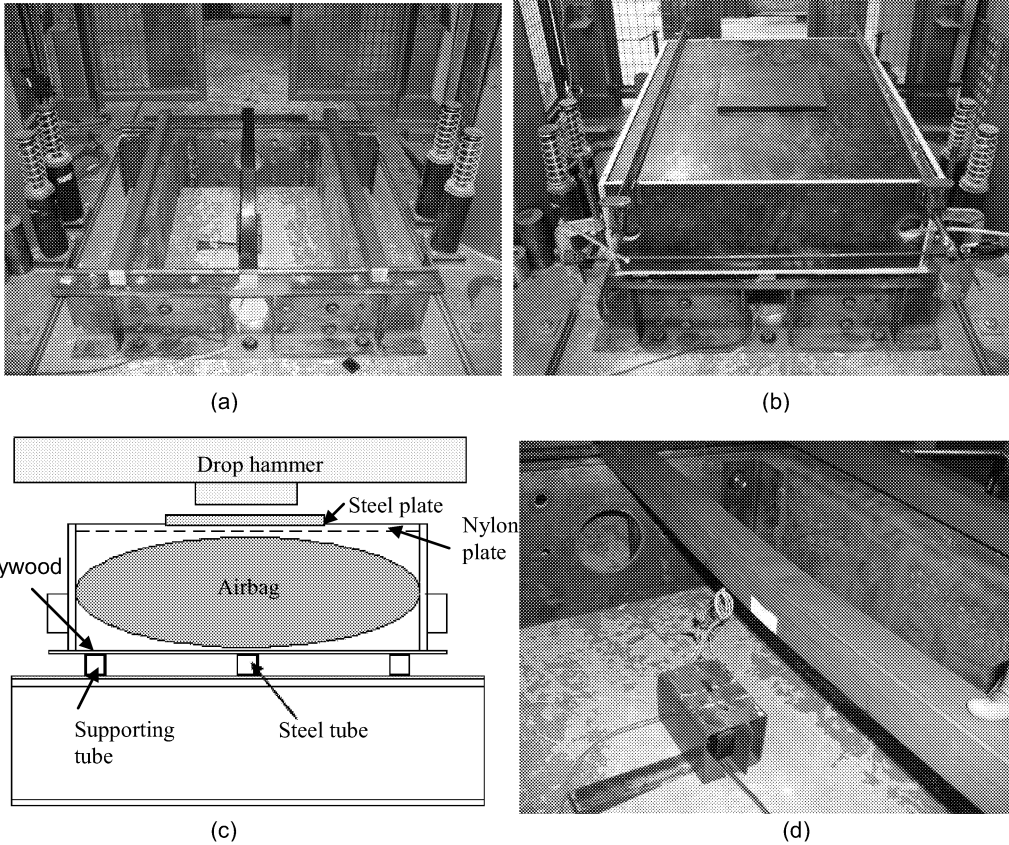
(a) Plan view of steel tubes positioned on top of the supporting frame; (b) complete setup of the test with the airbag confined in the plywood box; (c) cross section view of each component in the test ; (d) deformation of the tube after Test 2.
